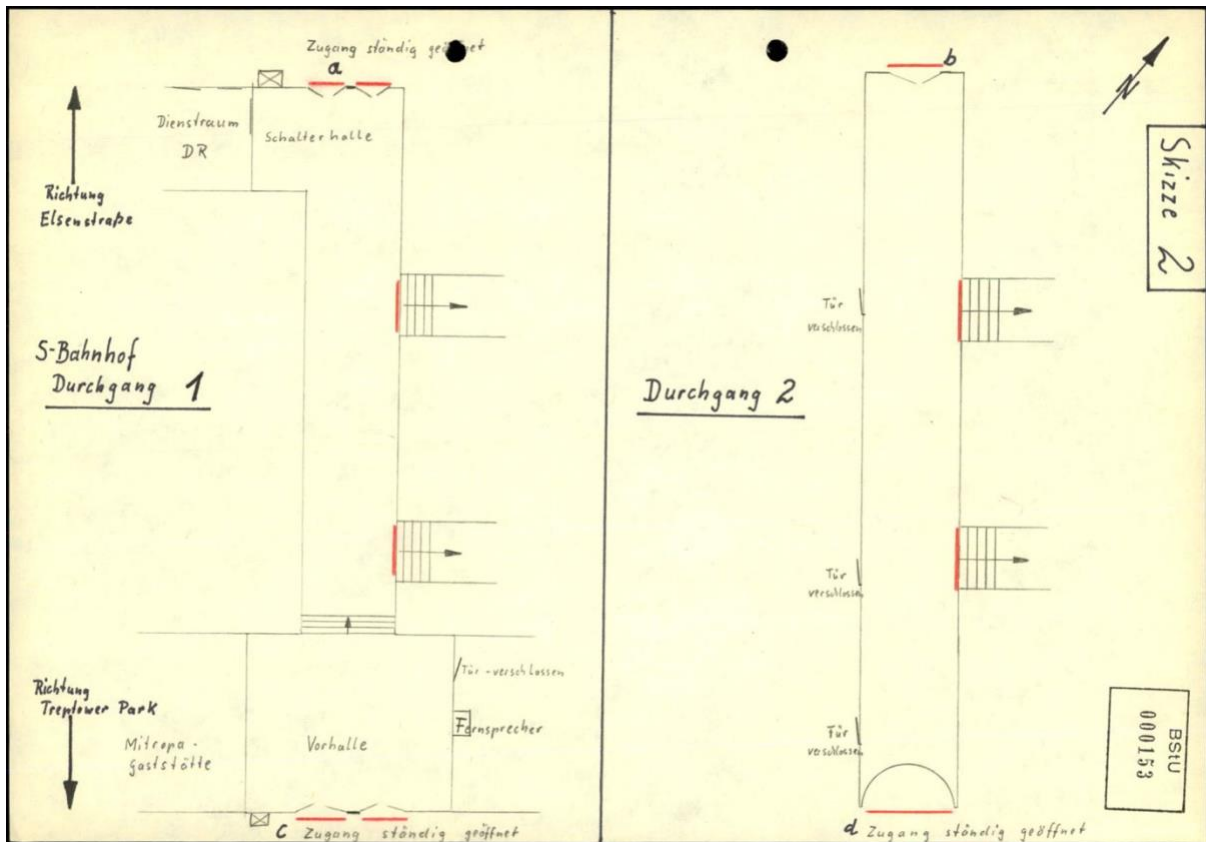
“Aufklärungsmaterial S-Bahnhof Treptower Park,” Hand-drawn sectional plans of the Treptower Park S-Bahn station's ground level, specifically of the two passages connecting the station's west (Durchgang 1) and east (Durchgang 2) entrances, Berlin, 1985, BArch MfS HA VIII 3623, 153.
